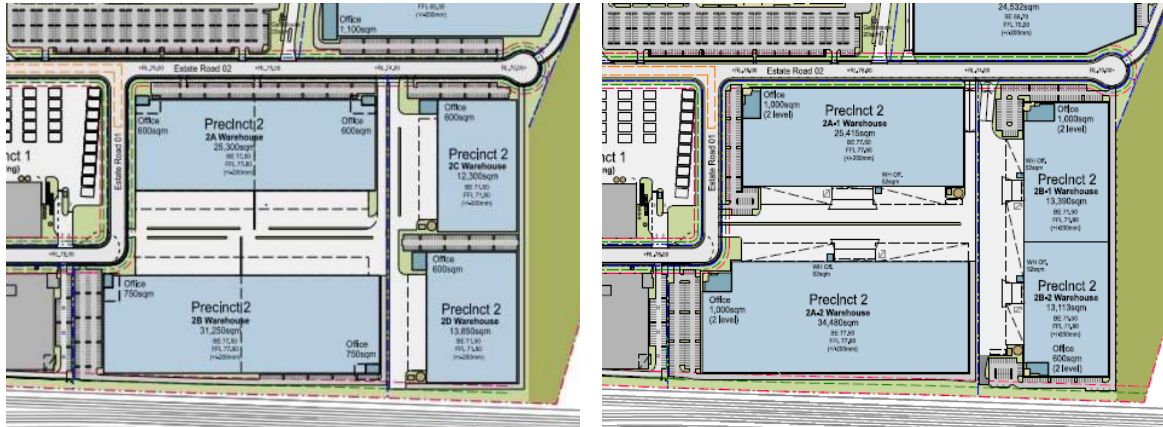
Approved Concept / Proposed Precinct 2 layout
